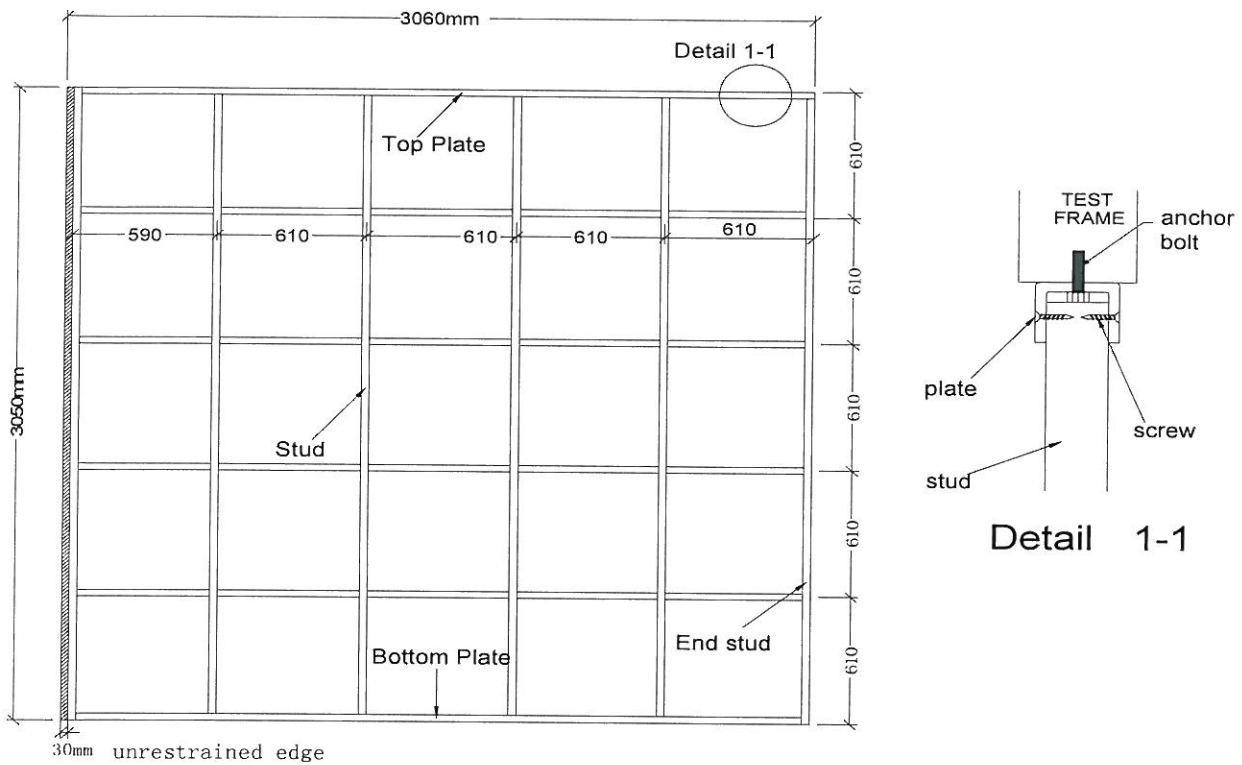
General Arrangement of the Steel Frame of the Specimen
